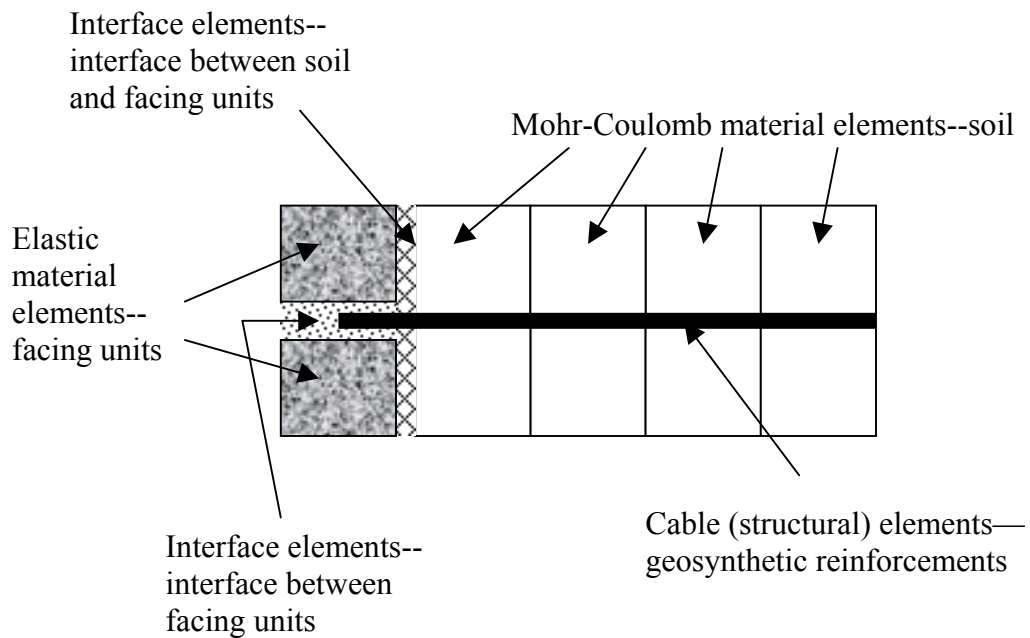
Typical section of modular block GRS walls modeled using FLAC.
